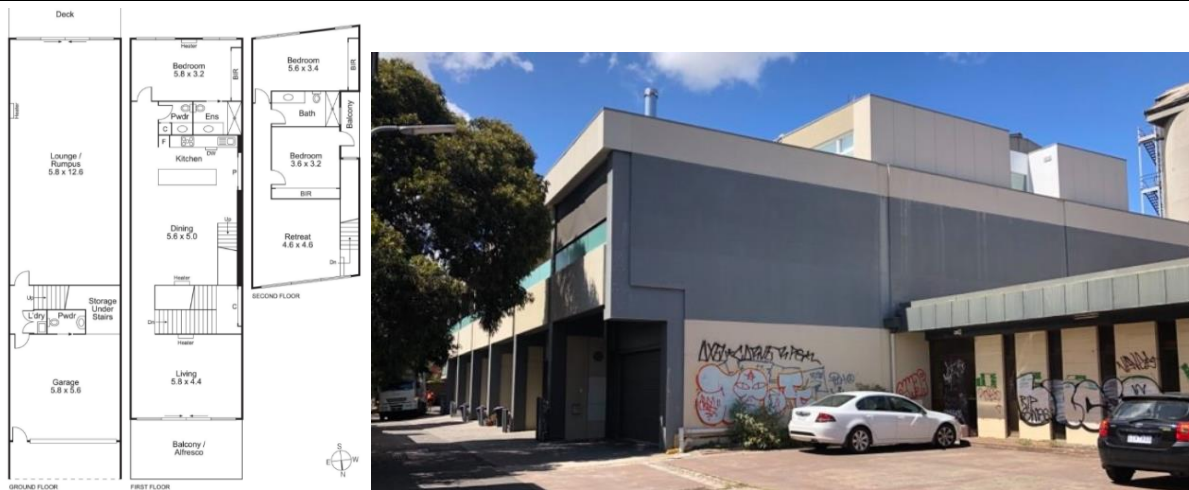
Internal Layout of No. 27 Barrow Place (left domain.com.au, accessed April 2021) and the western and northern facades of No. 27 Barrow Place (right – Planning Officer Photos, February 2021).
